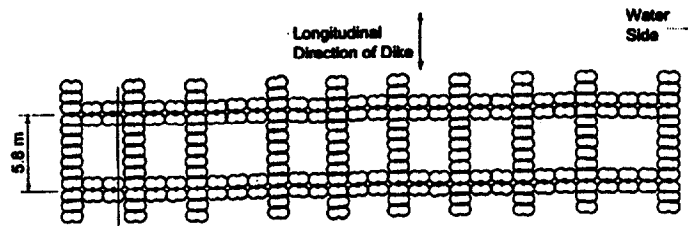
Details of the DMM used under the hotel and terminal building, Kobe, Japan (Kamon, 1996).
